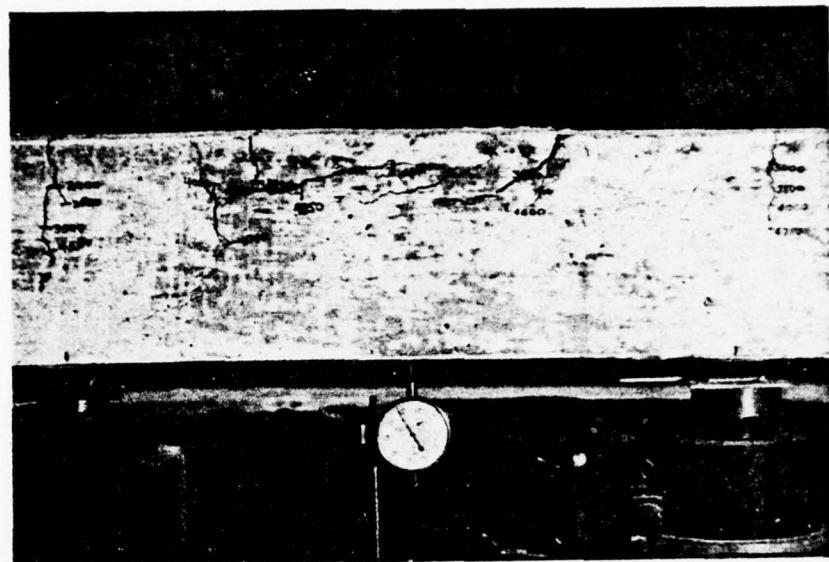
Beam T-4-C. Load = 5.5 kpj. Side Split Failure Occurs.
